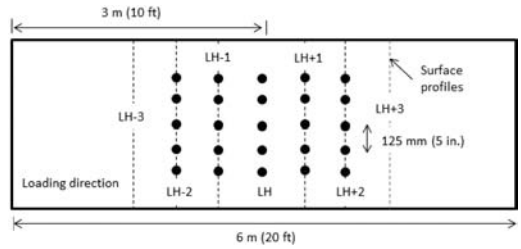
Layout of drill holes and surface profile measurements in test lanes.
